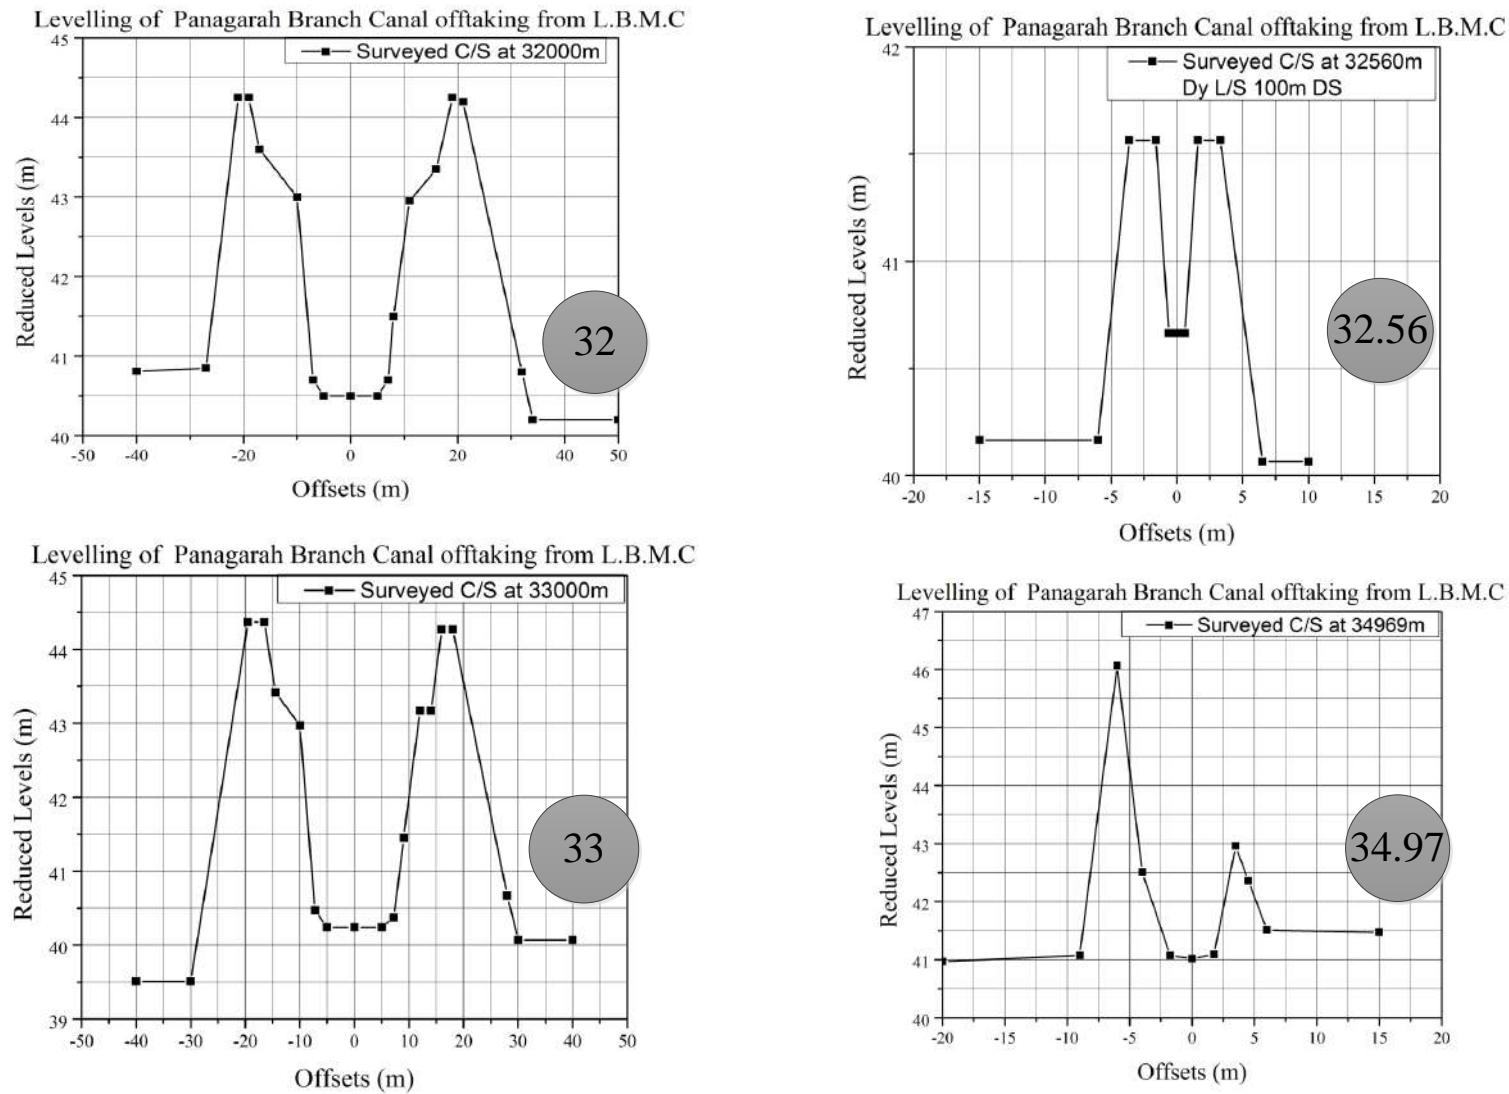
Canal cross section from 32 km to 34.97 km on Panagarah branch canal
